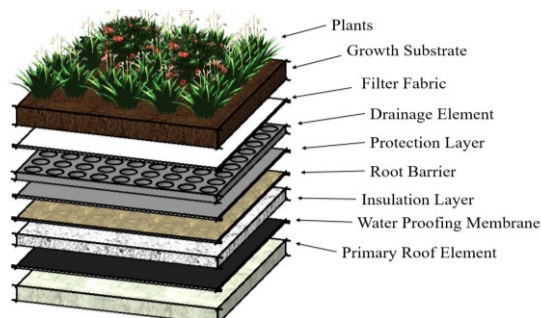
Schematic diagram of the layered structure of a typical green roof system. (Source: Vijayaraghavan, 2016)
